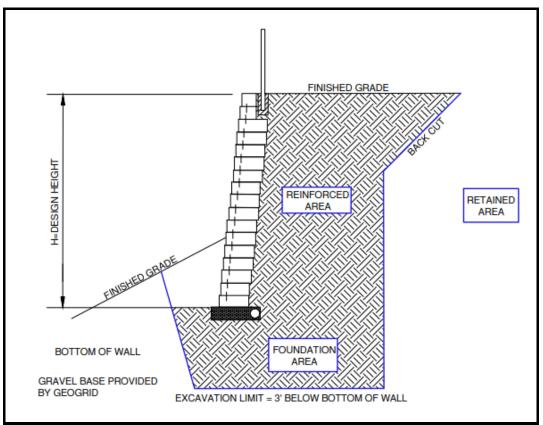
Typical Areas of Select Backfill for MSE Walls
